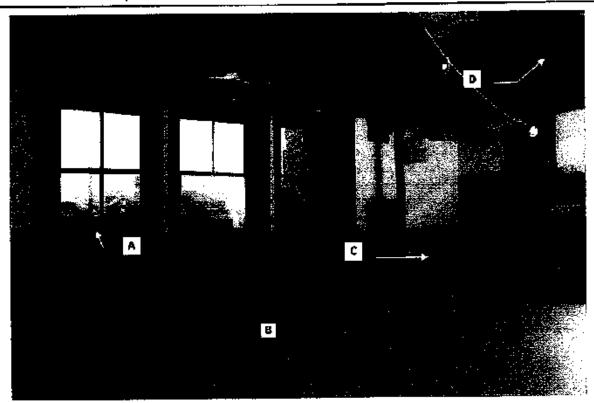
Room 2 view southeast. (A) Fenestration Type 1 -- Basement Exterior, (B) Floor is painted white, (C) Non-historic wood burning stove, (D) Ceiling is covered with a tarp.
